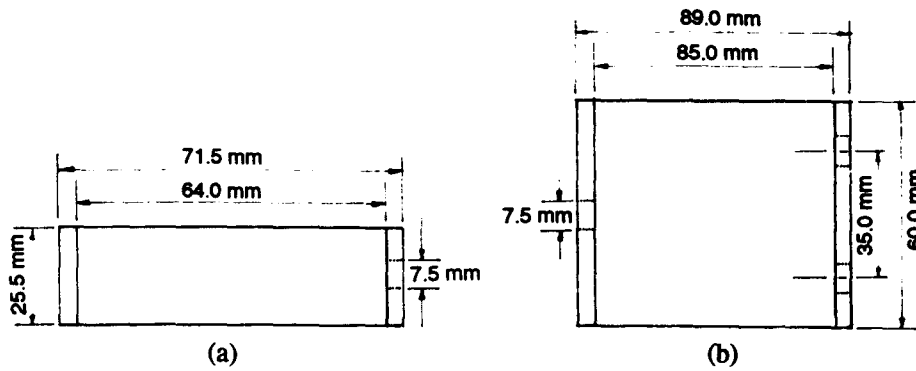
Modified oedometer rings used in the collapse tests; (a) for tests S1M, S2M and S3M, (b) for test S4M.
